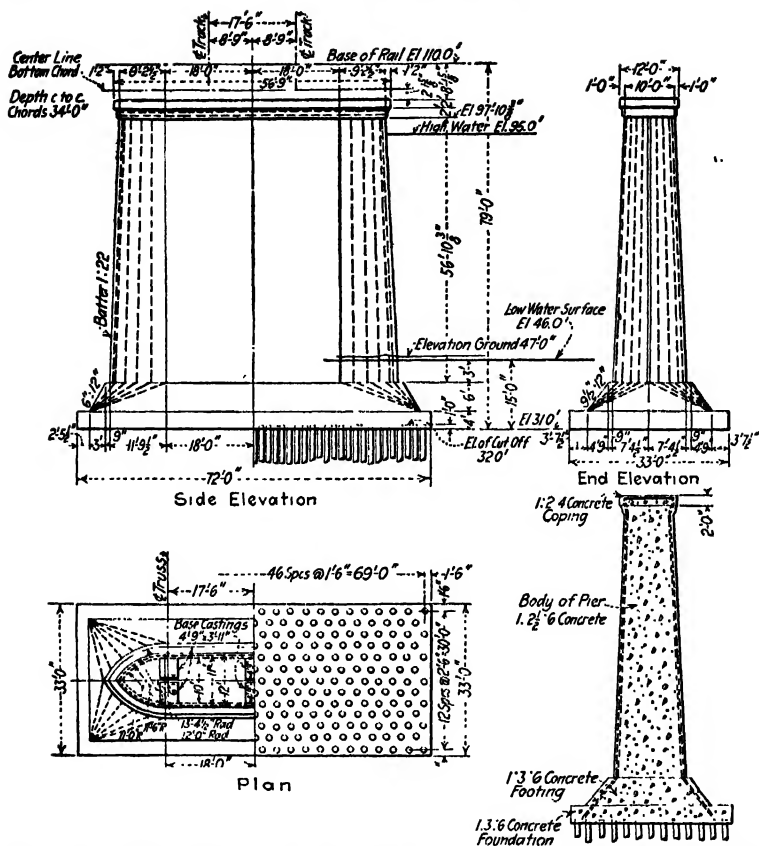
River Pier 5, Illinois Central Railroad Bridge over Tennessee River, Gilbertville, Ky.
